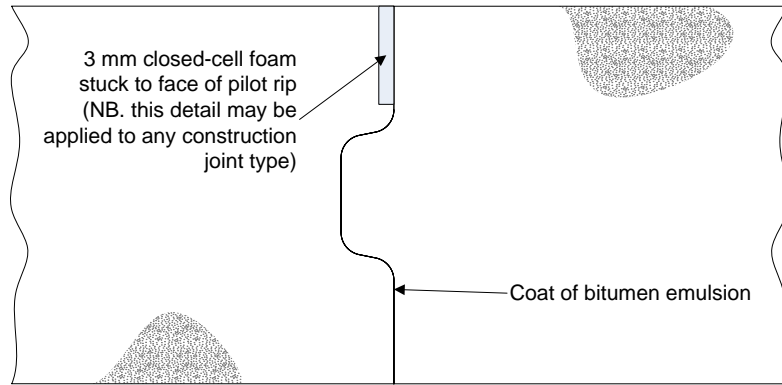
Profiled construction joint, with former to mitigate joint rotation
